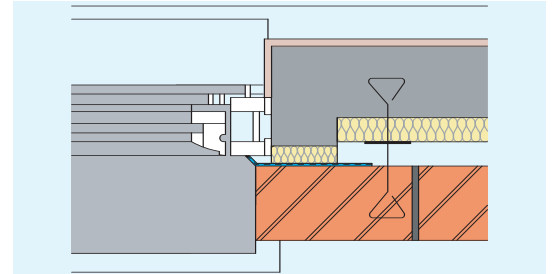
Plan view at jamb, showing Rockwool Rockclose with Aluminium frame in rebated 'check' reveal.
